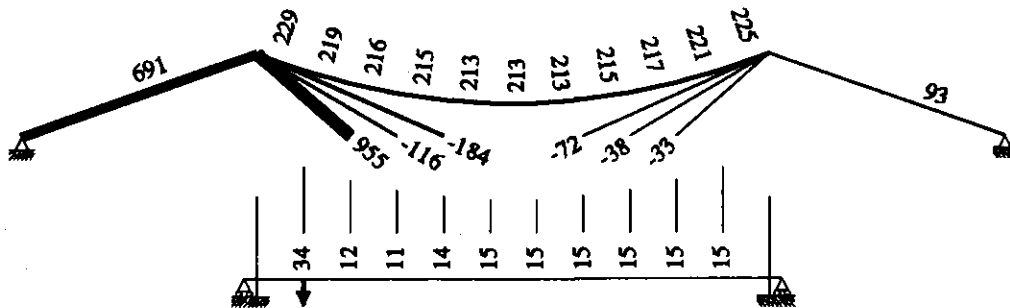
Live Load Forces and Deflections in Deck of Rock Church Bridge with Lightly Stiffened Deck
